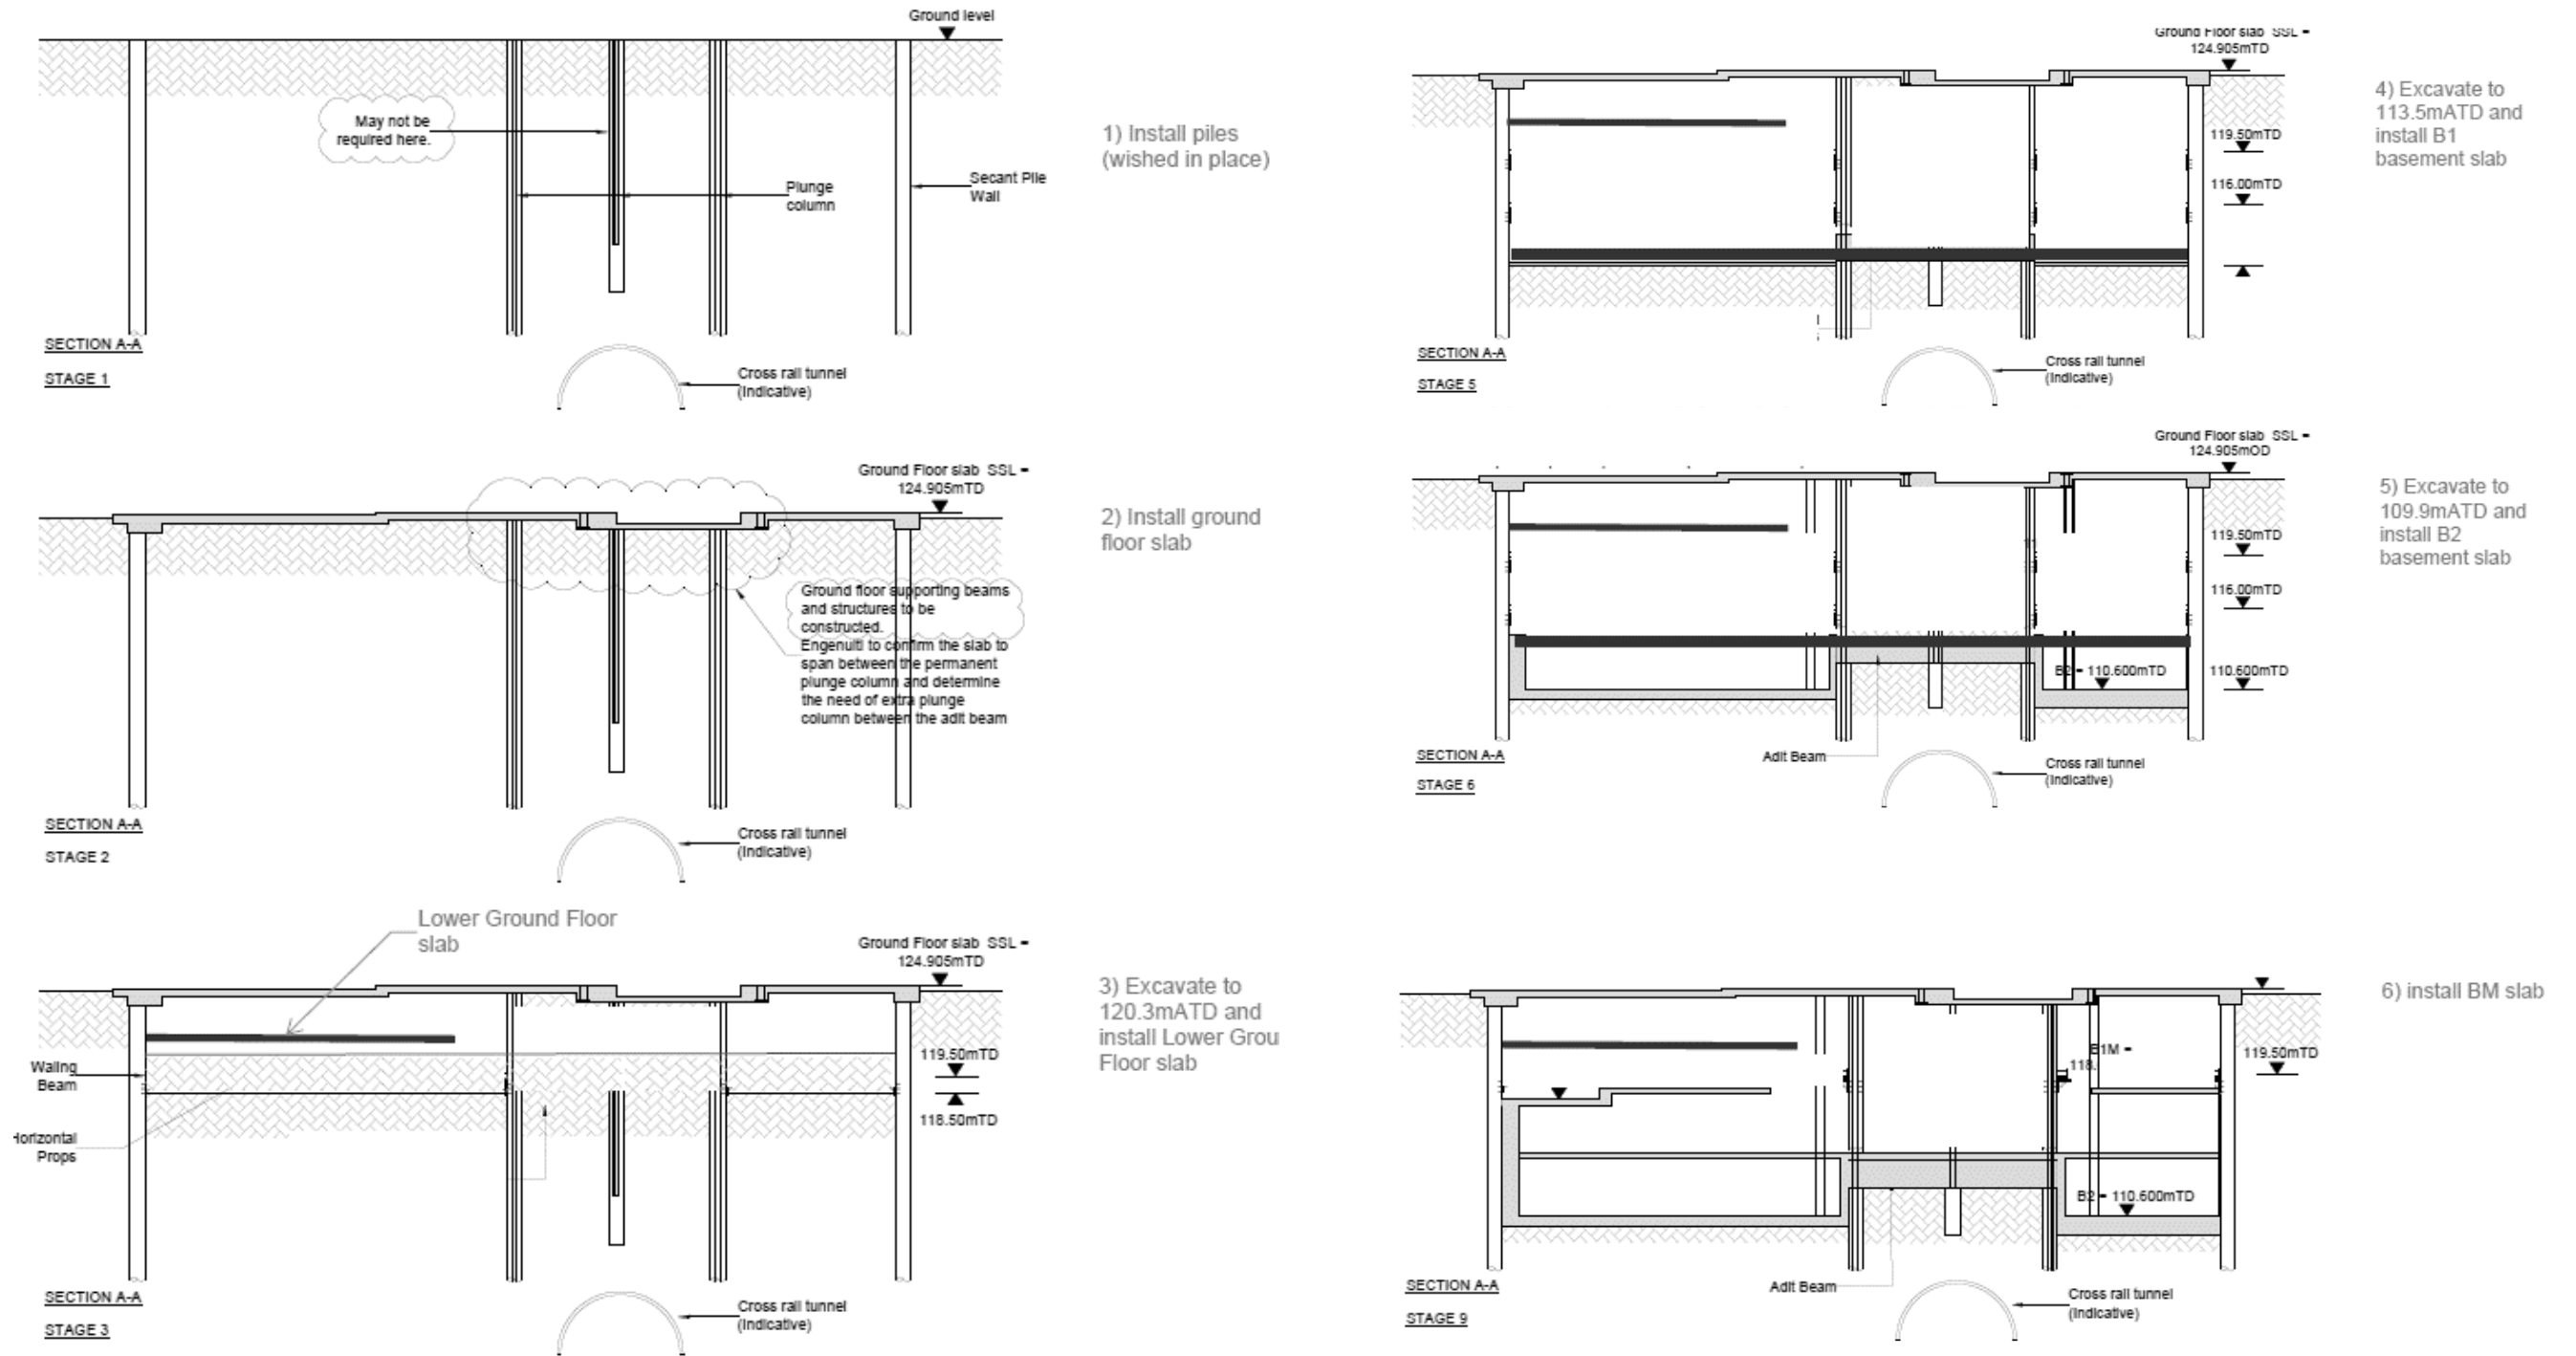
Proposed alternative basement construction sequence (not to scale).
